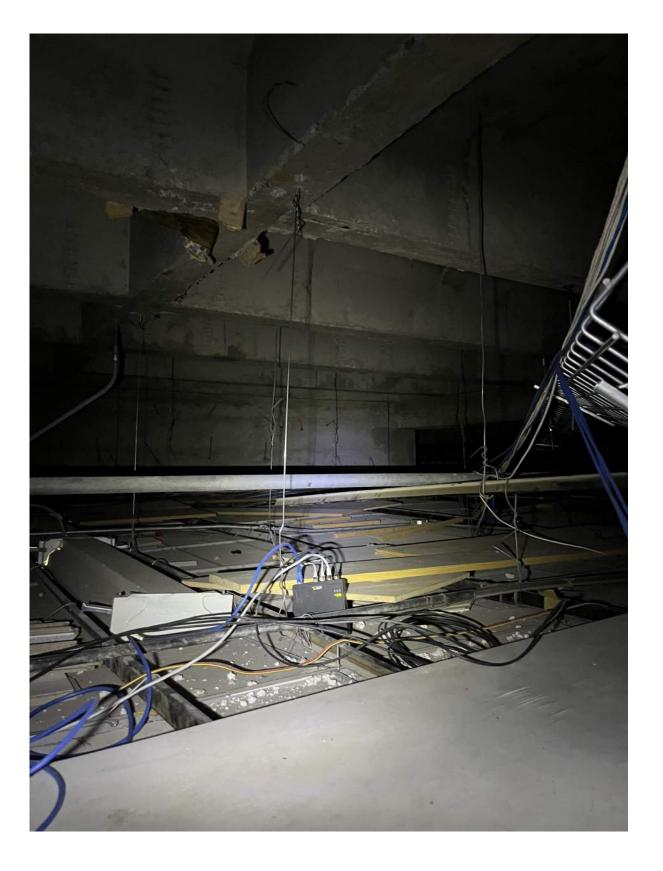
Support of 1st floor suspended ceiling in section of original building
